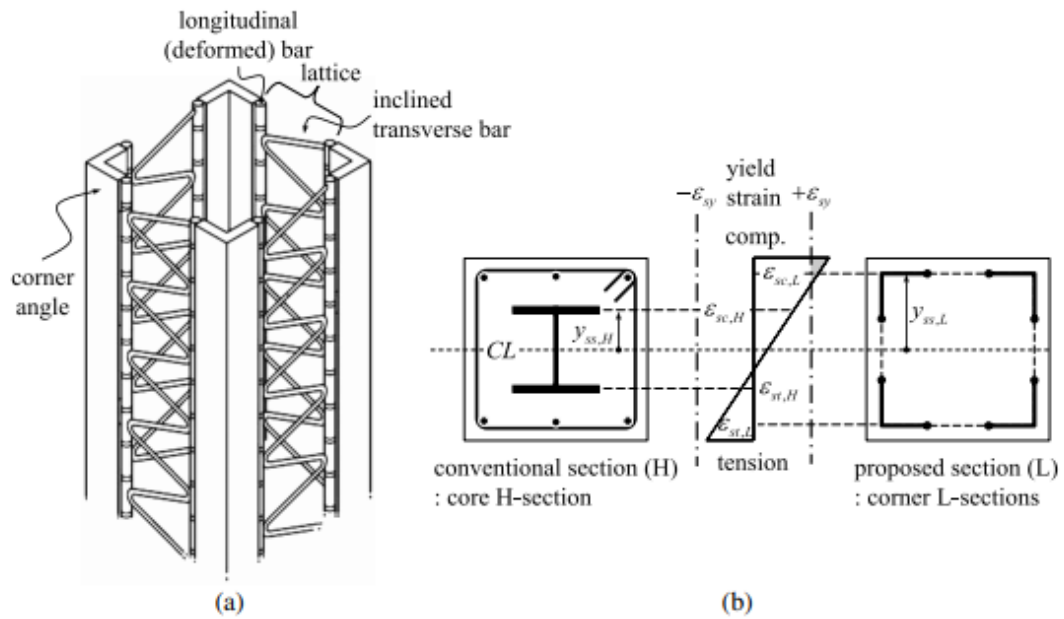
Concrete encased steel column with L corner sections: (a) prefabricated steel section with lattices, (b) strain distribution in steel sections. Kim et al. (2014)
